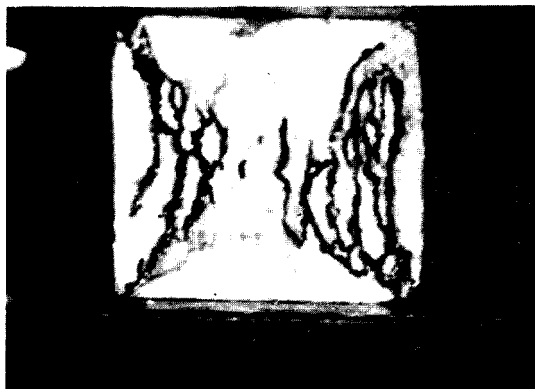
Crack pattern of the cubic specimen loaded up to failure
